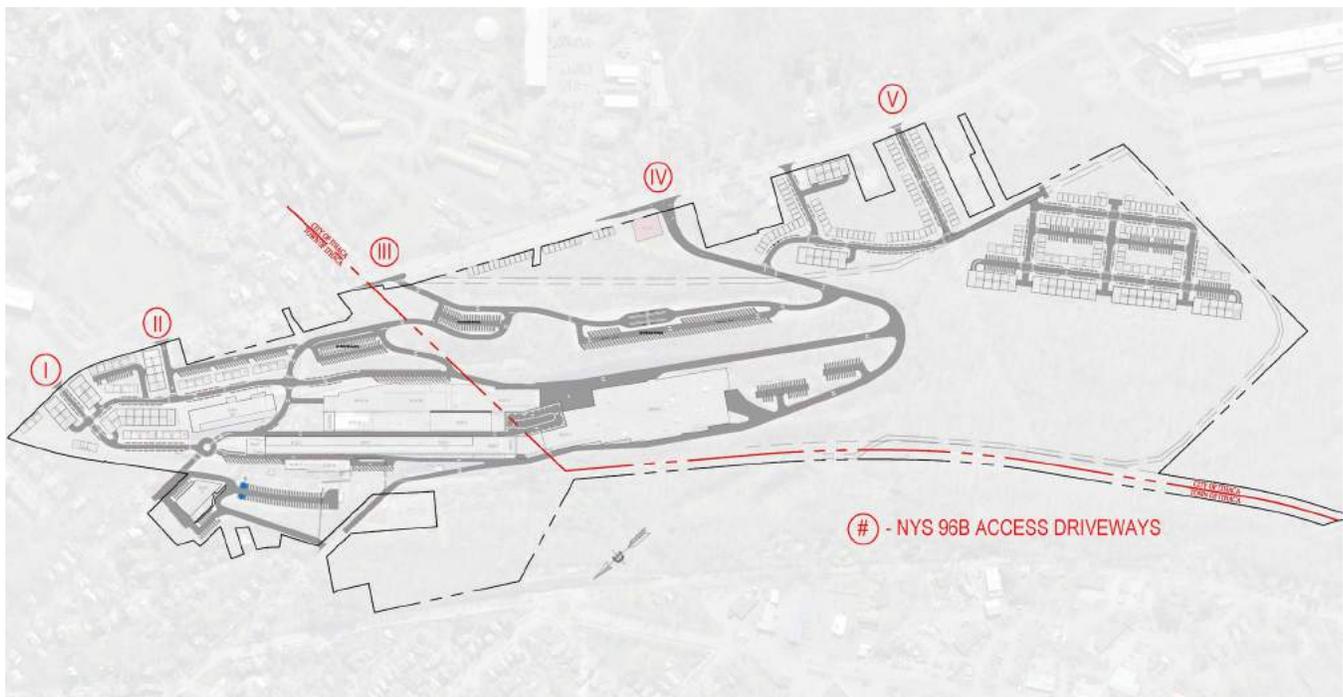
Overall Conceptual Site Layout Plan Indicating Proposed Parking Locations and Driveways (CJS + FE)
